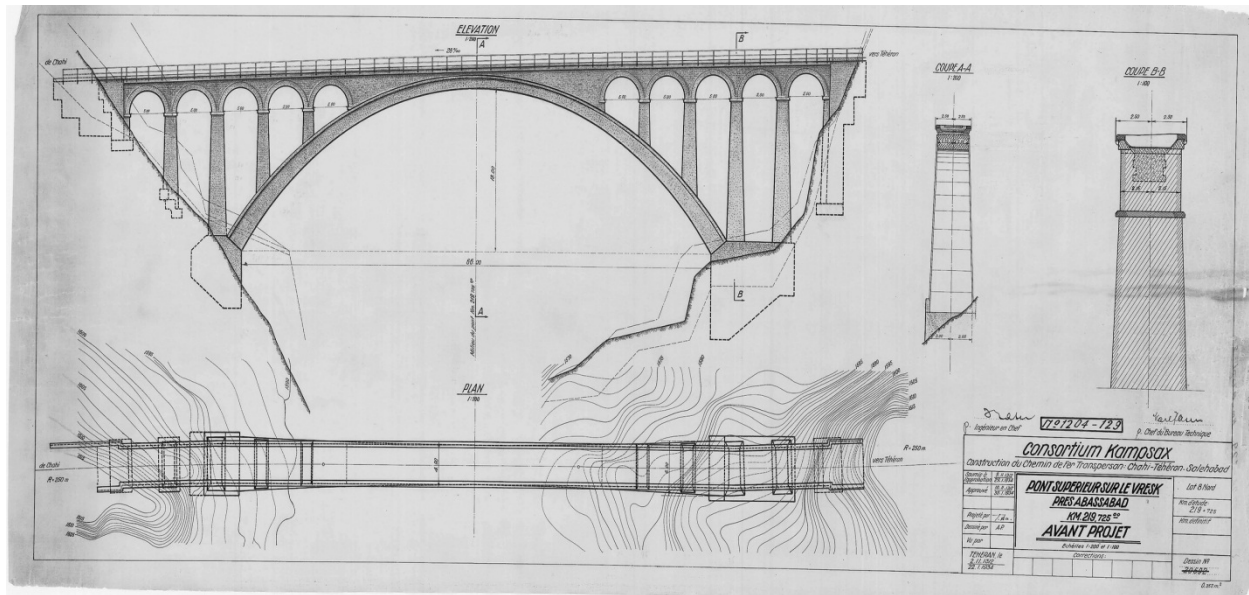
Vresk bridge: Plan and Elevation, Designed and drawn in 22.1.1934 (Courtesy Consortium KAMPSAX).
